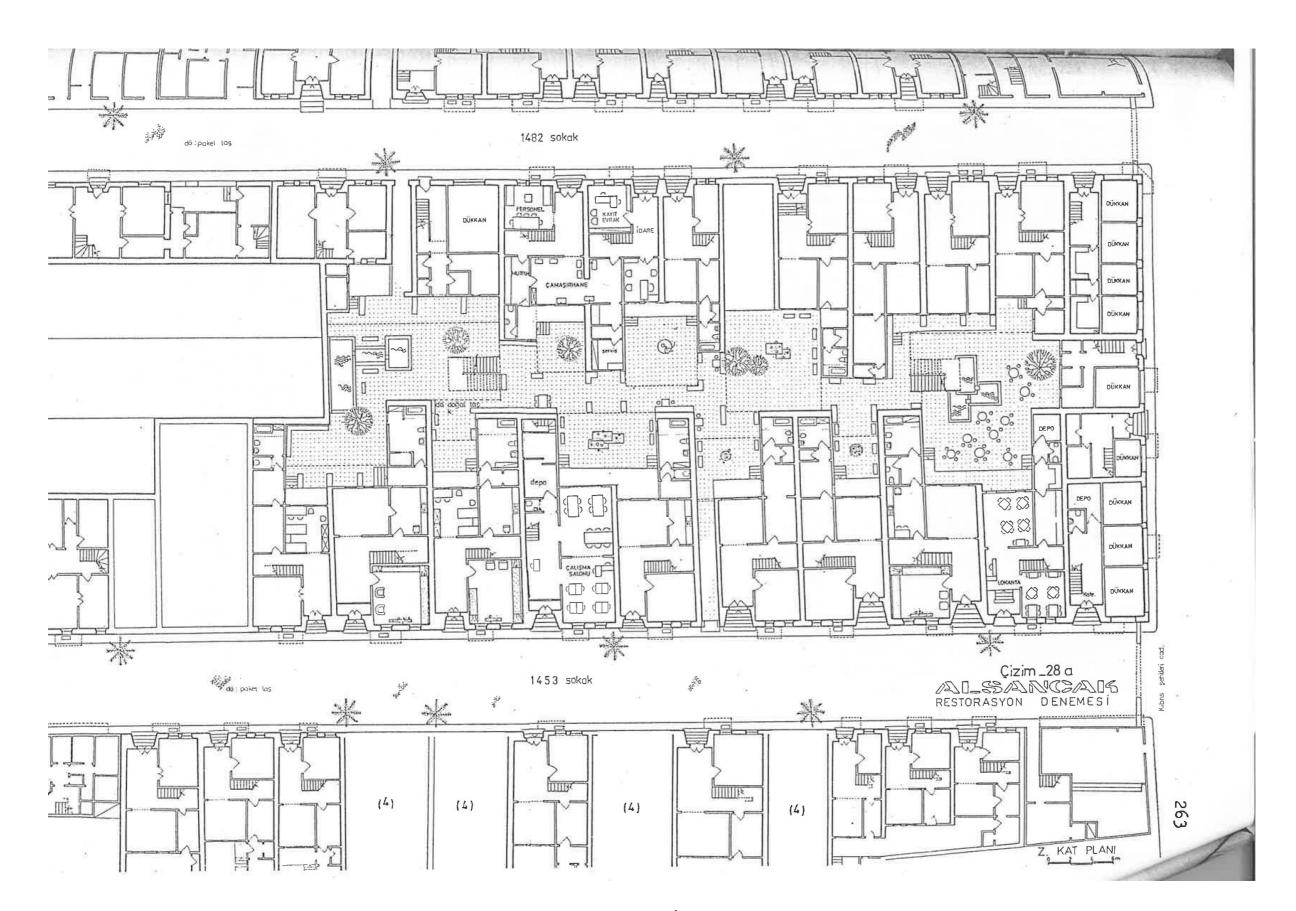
Ground Floor Plans of İzmir Houses on 1453 streets (Source:Akyüz 1985)
